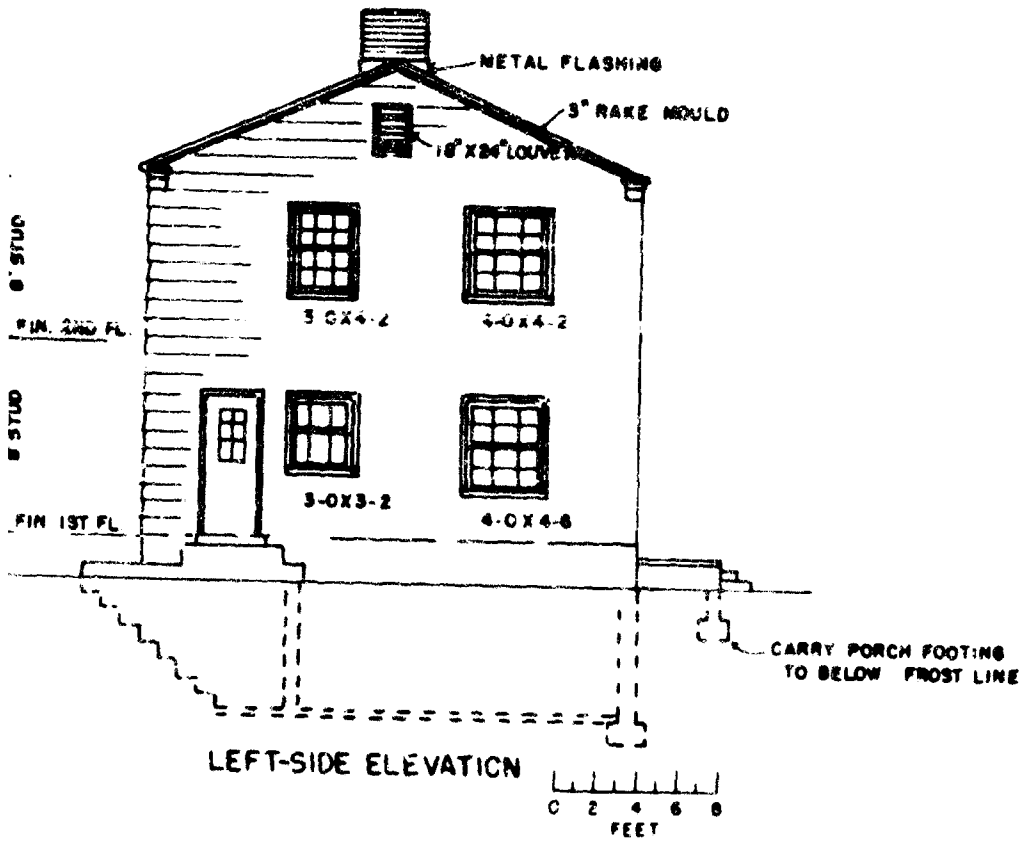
Elevations for a two-story wood house, PCDA Drawing No. 2.
